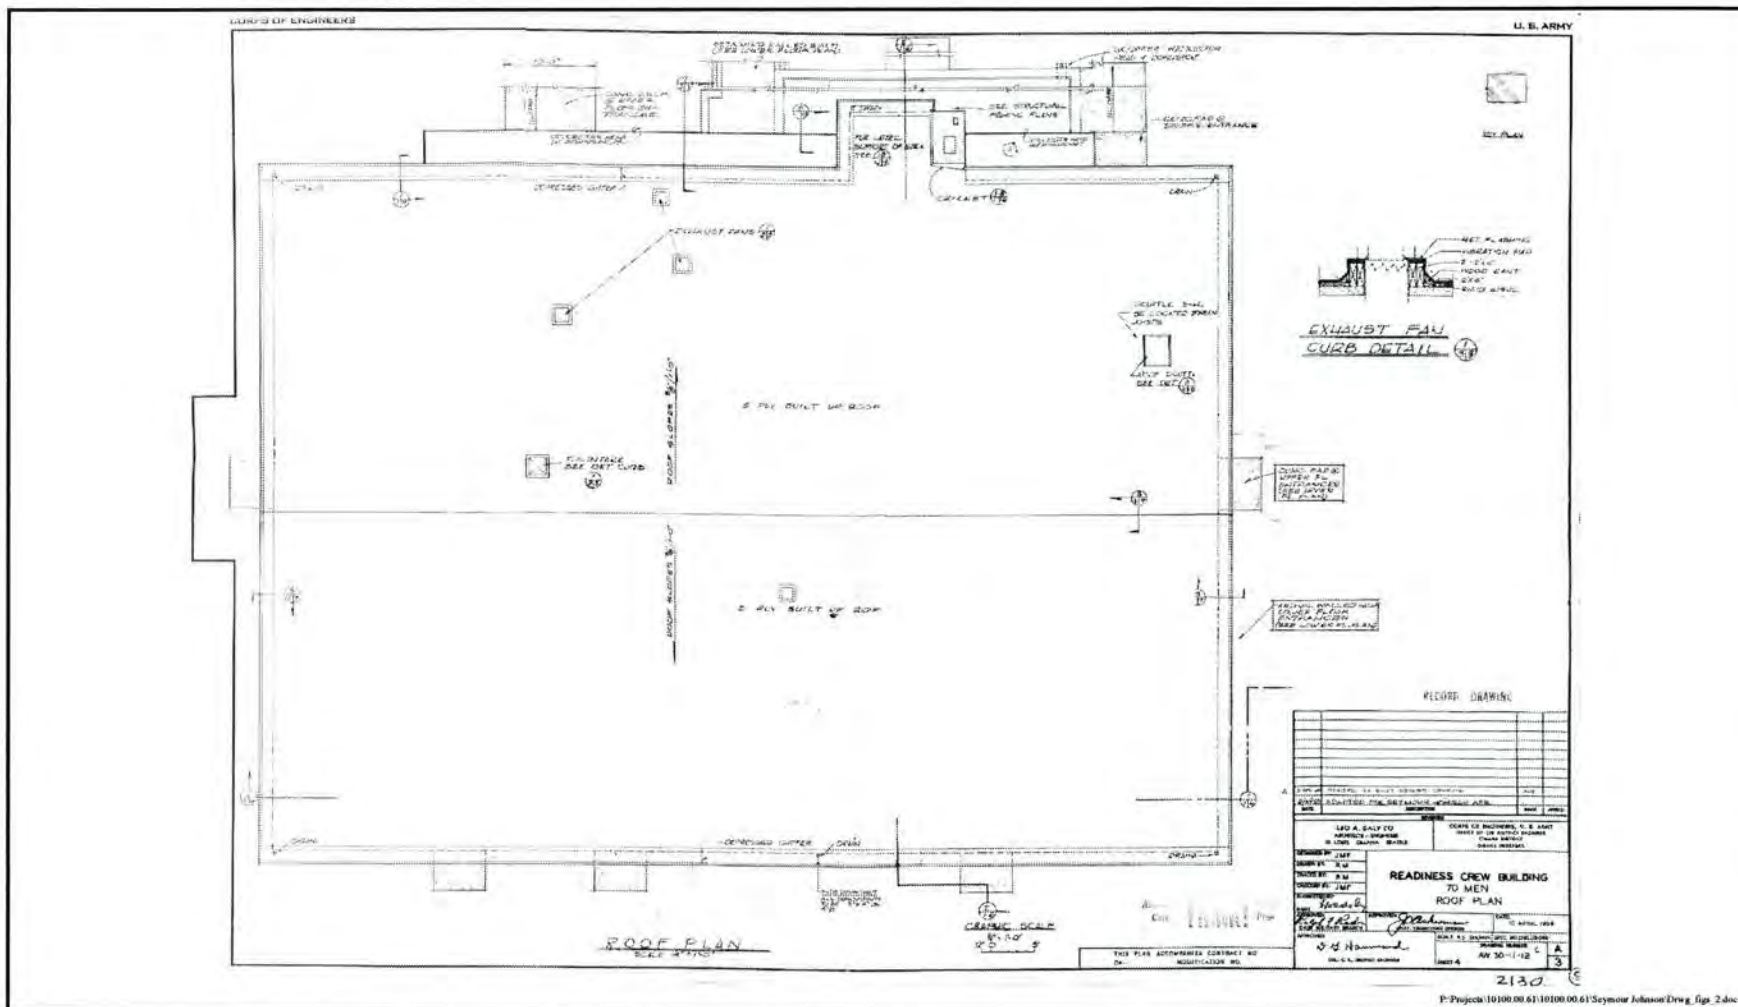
Building 2130—record drawing, roof plan, 1958 (Source: Seymour Johnson Air Force Base Civil Engineering Vault).
